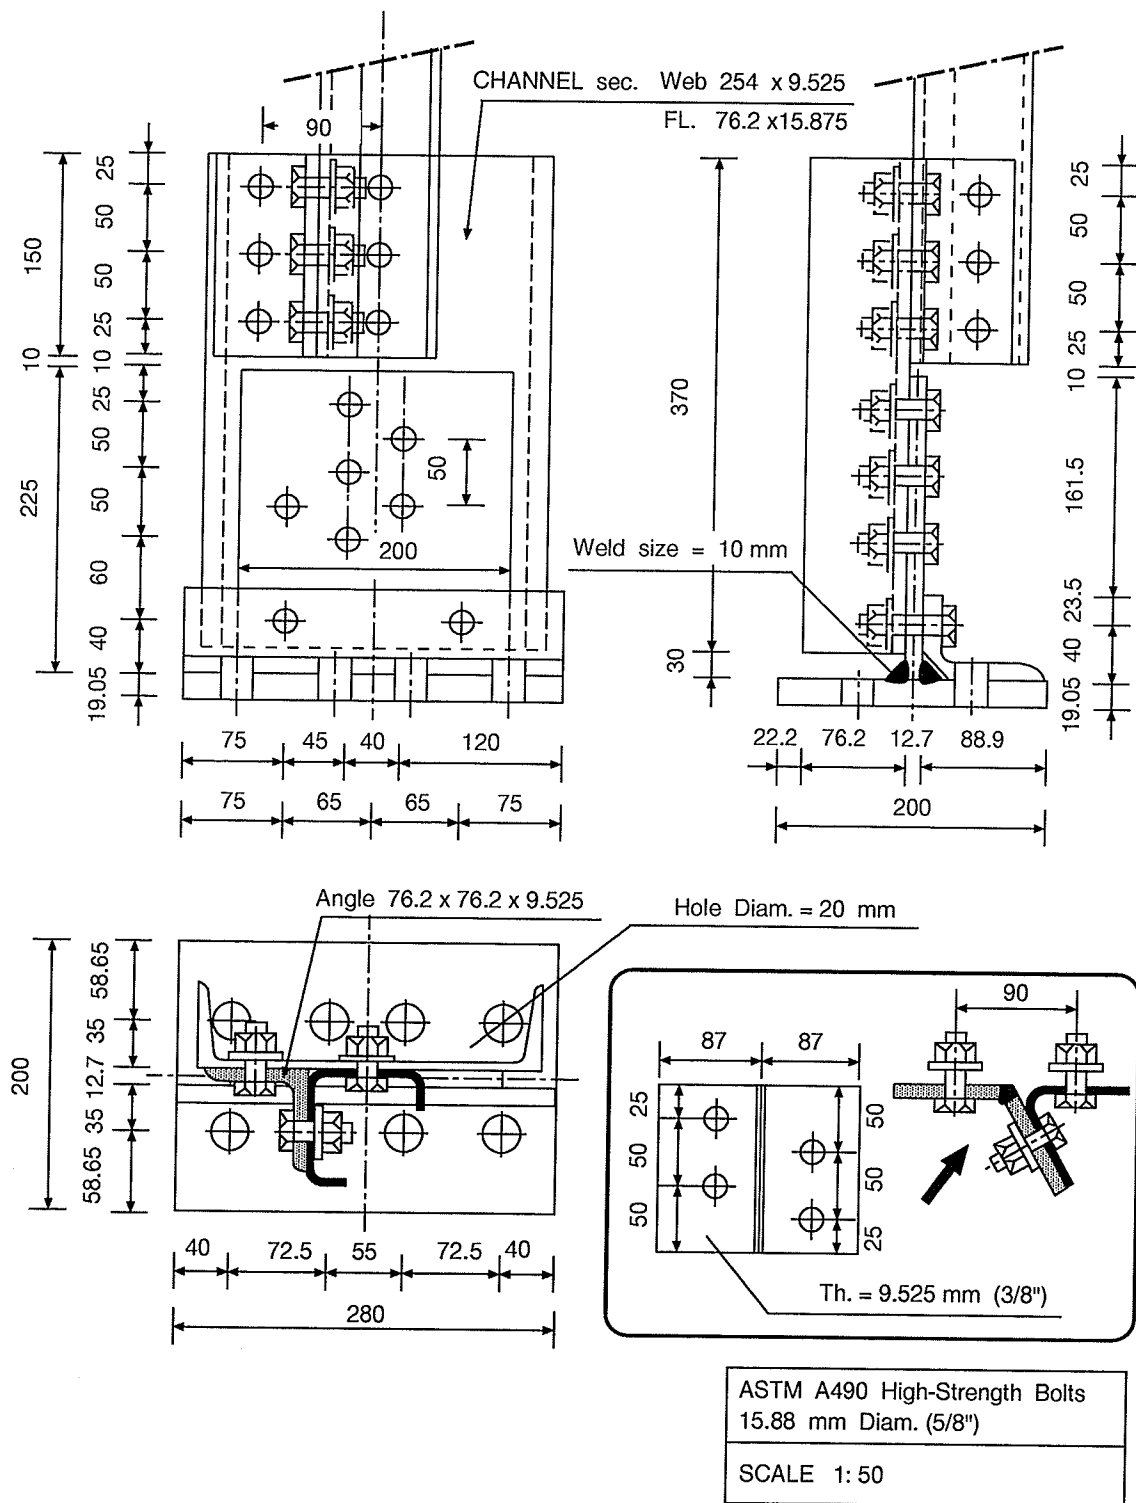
Connection Type "D" Used with Test Setup # 1.
